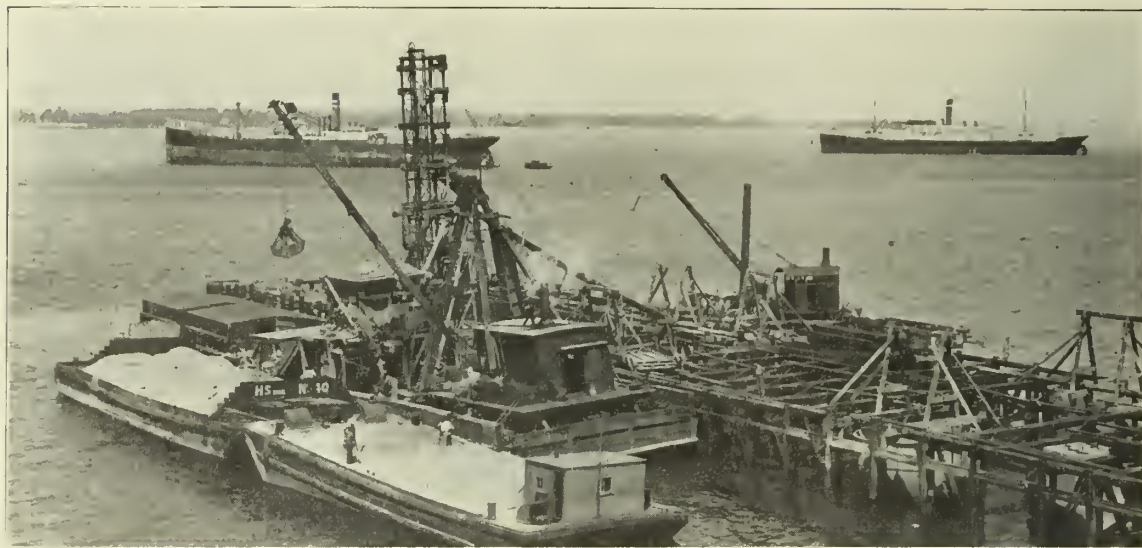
Material Scows and Concrete Plant at Norfolk & Western Ry. Coal Pier No. 4, Lamberts Point Terminal.
